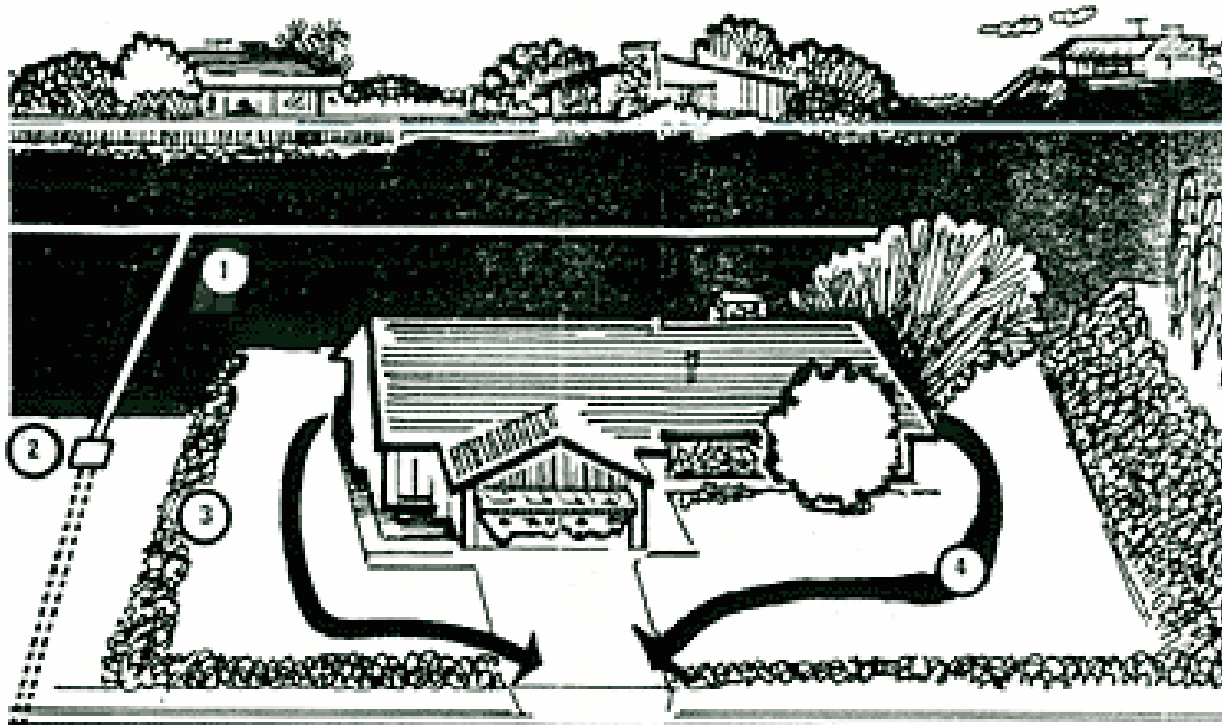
INLET/FRENCH DRAIN AND DRAINAGE LAYOUT
